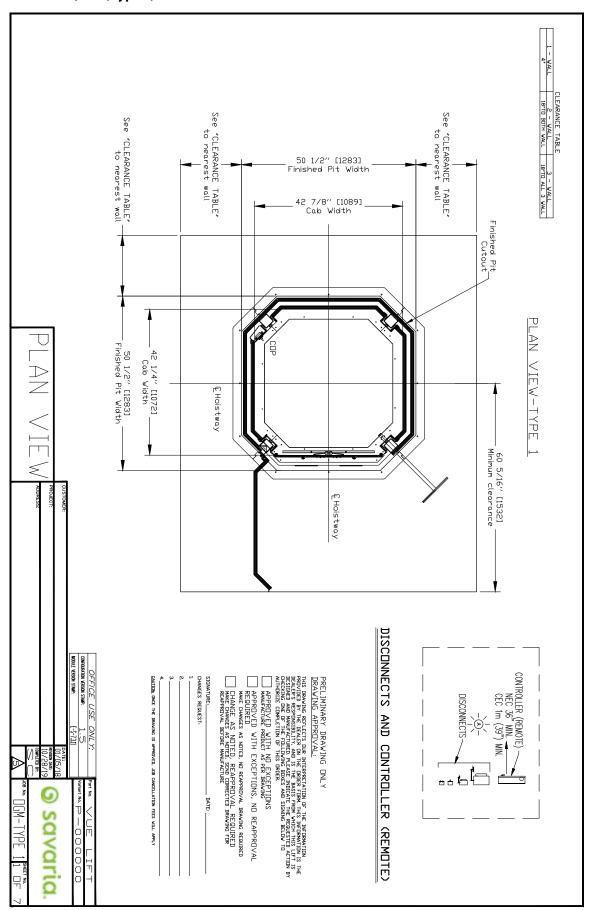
Pit/bottom floor/thru-floor view (OGM, type 1)
